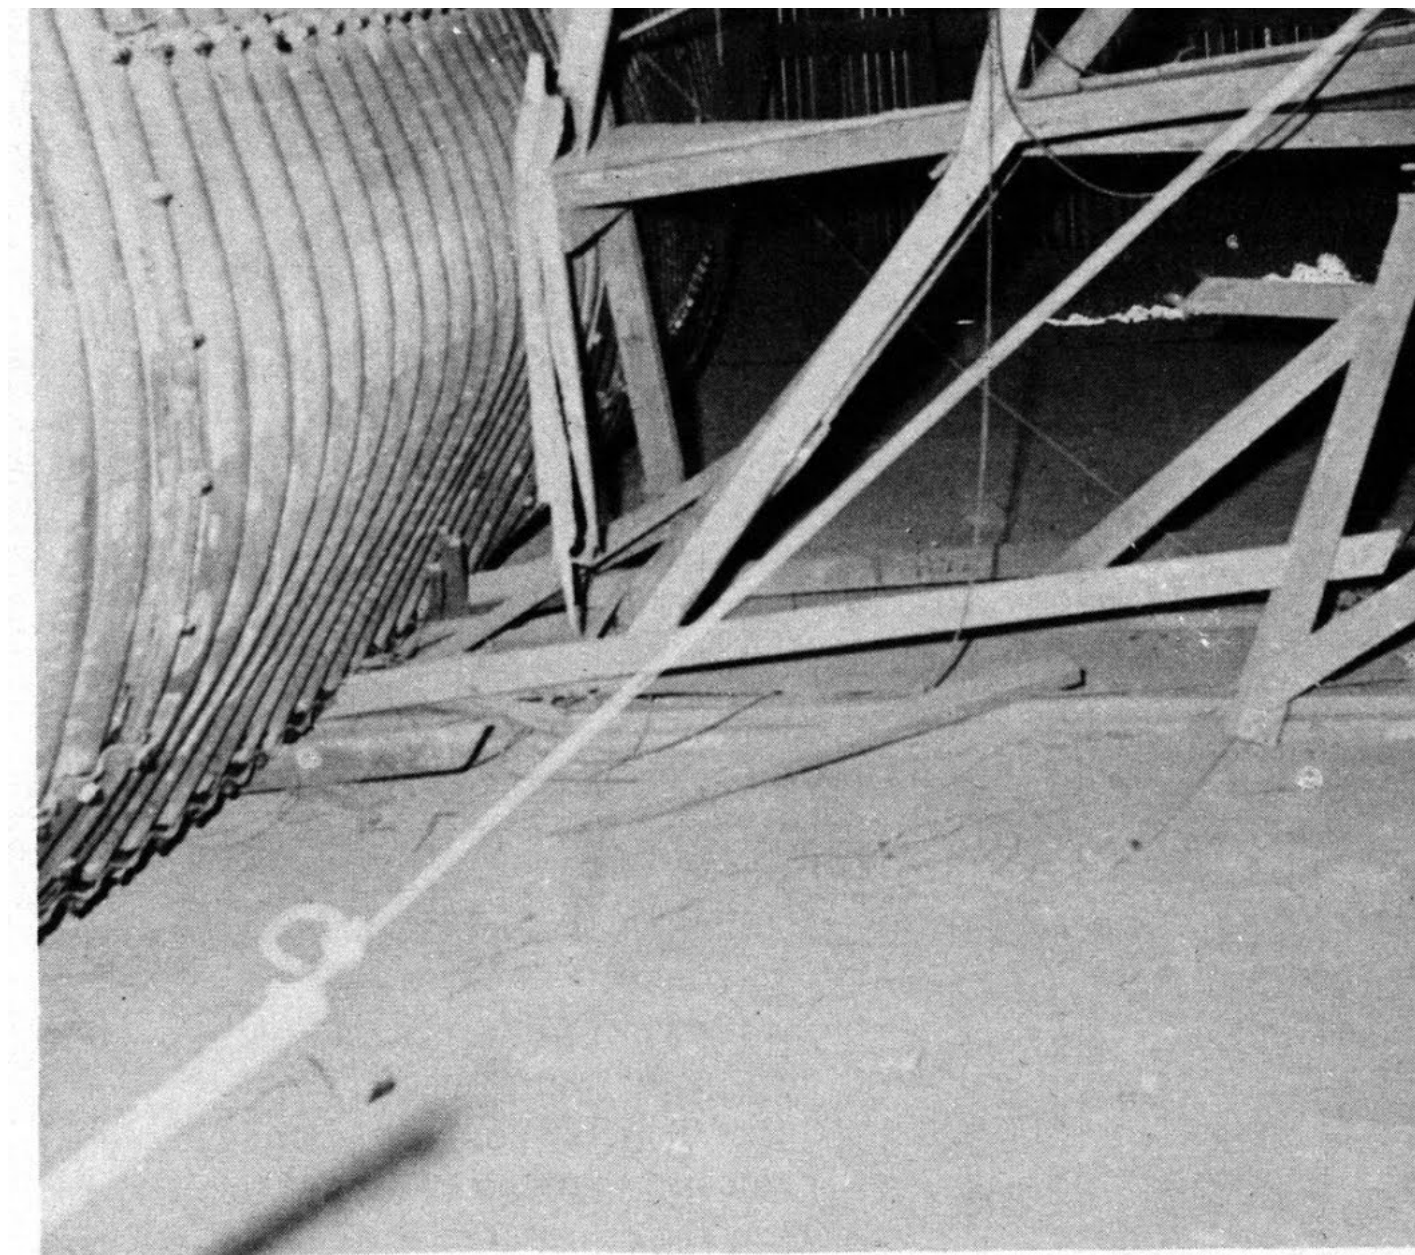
B-type damage to earth-covered 10-gage corrugated steel
